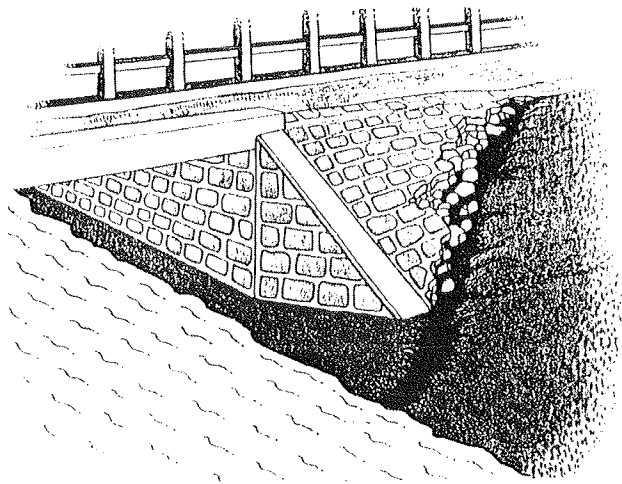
Typical handbook illustration: erosion damage to embankment.
